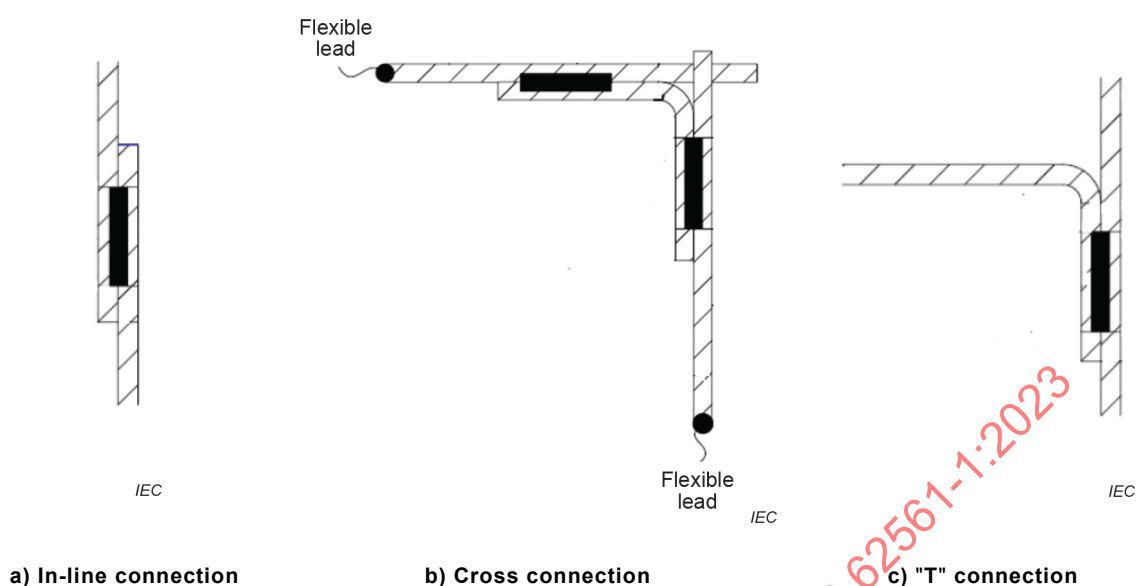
Basic arrangement of specimen with welded, brazed or exothermic connections of reinforcing rods
